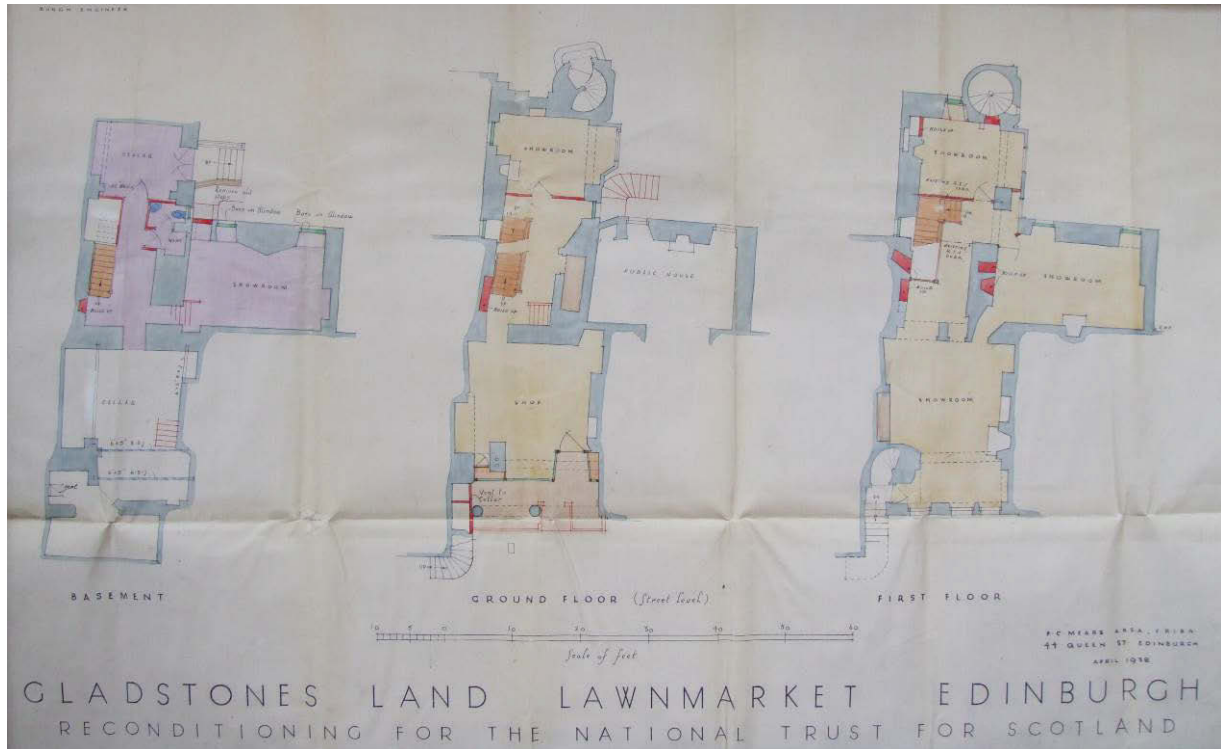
Plans showing plans for basement to first floors, scheme warranted 3rd June 1938. City of Edinburgh plan store
